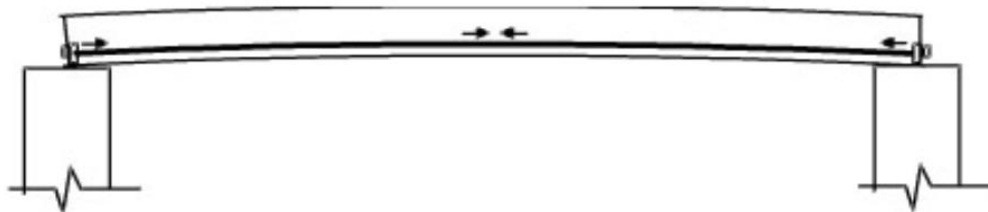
Beam under the effect of an axial load in the tension zone (Prestressing).
